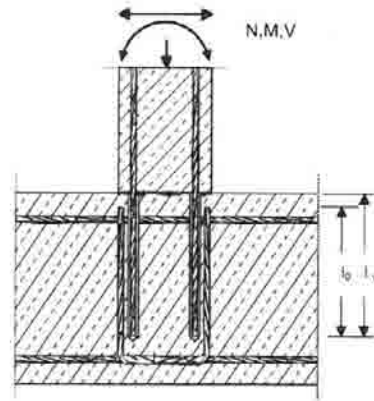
Overlap joint at a foundation of a column or wall where the rebars are stressed in tension
